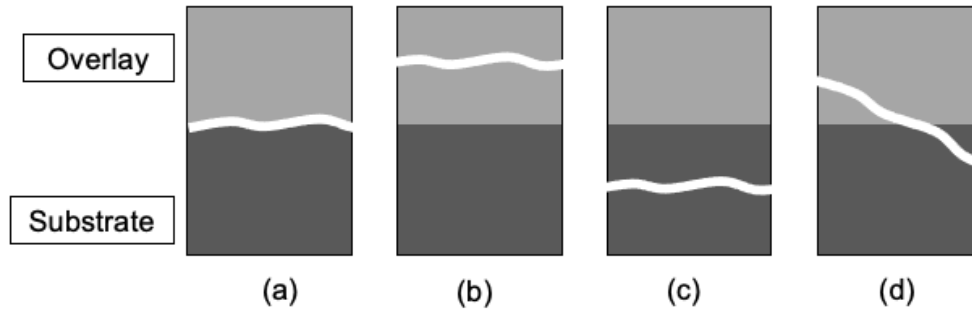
Concrete-to-concrete bond test specimen failure modes: (a) adhesive failure; (b) cohesive failure in overlay; (c) cohesive failure in substrate; (d) mixed failure.
